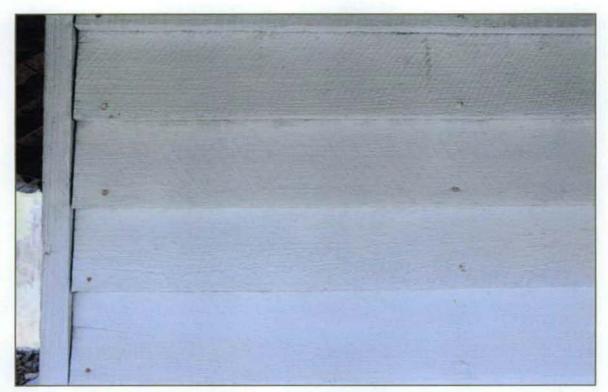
House, View #19, North Elevation, Detail of Siding, Camera Facing South
